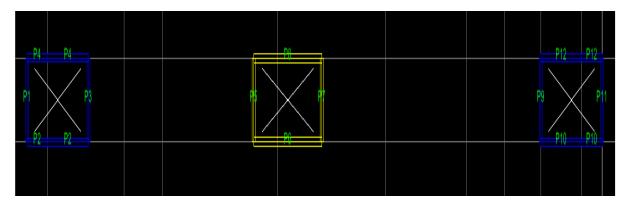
Pier Labels for the Concrete Masonry Shear Walls
